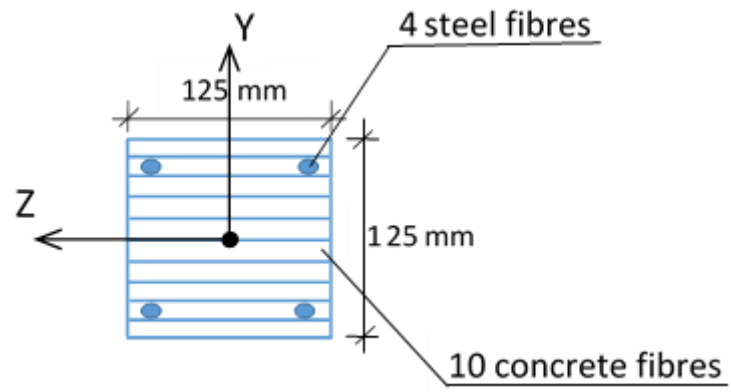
Fibre beam element cross section mesh for intermediate section of specimens
